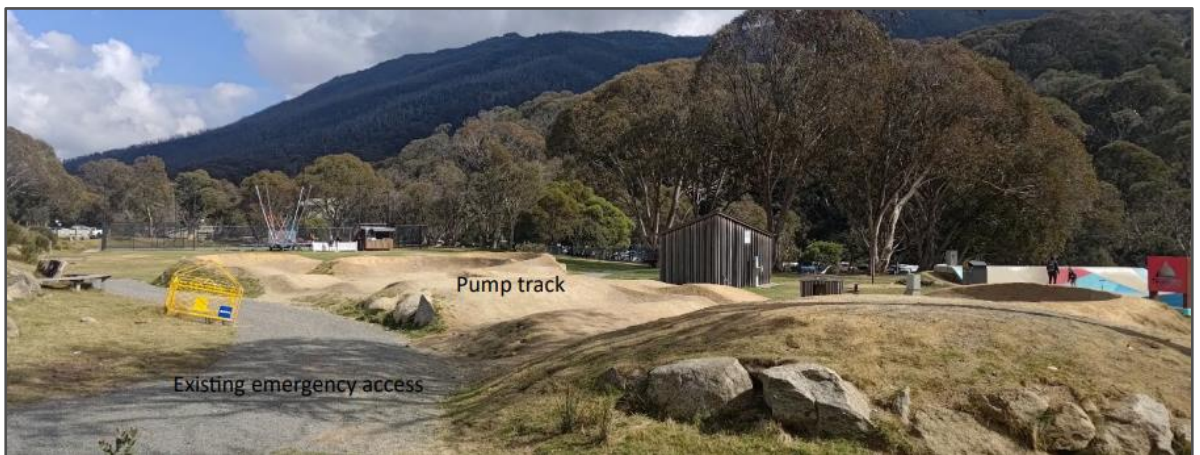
| Pump track and emergency access track (Source: Applicant's SEE)
